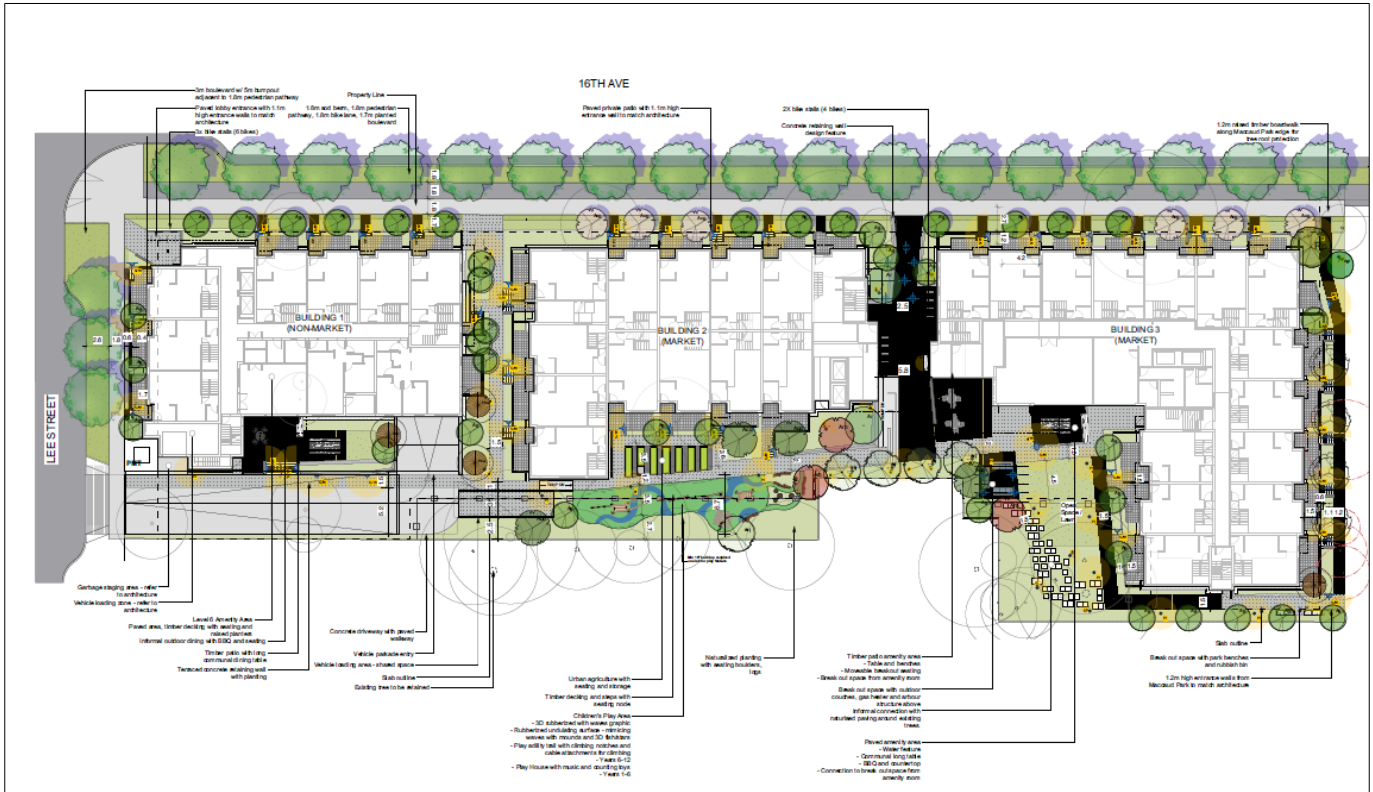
Site Plan of the APD Submission (Oct 1, 2020)
